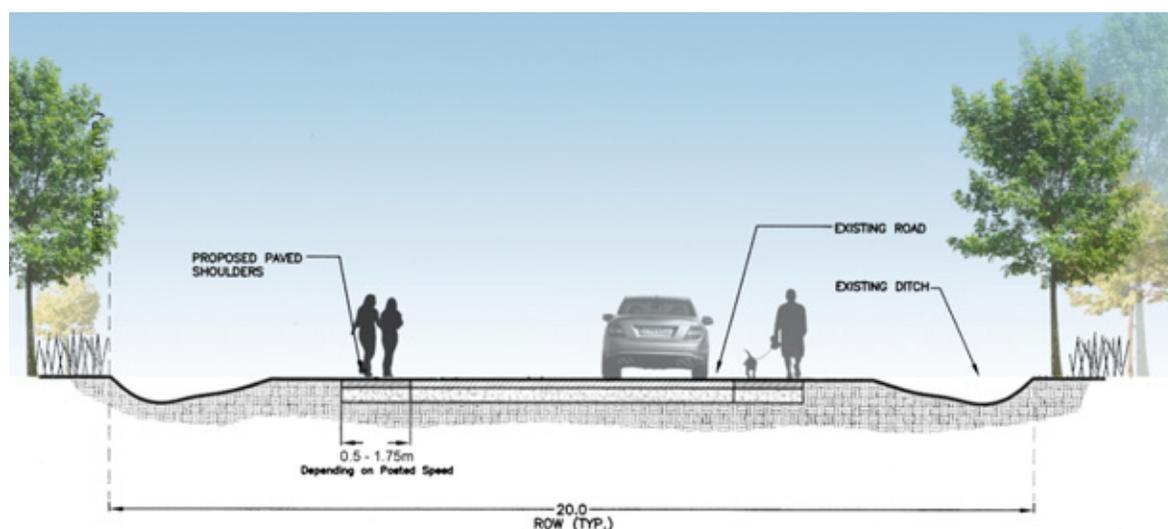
Cross Section of Road Shoulder Walkway in Rural Area
